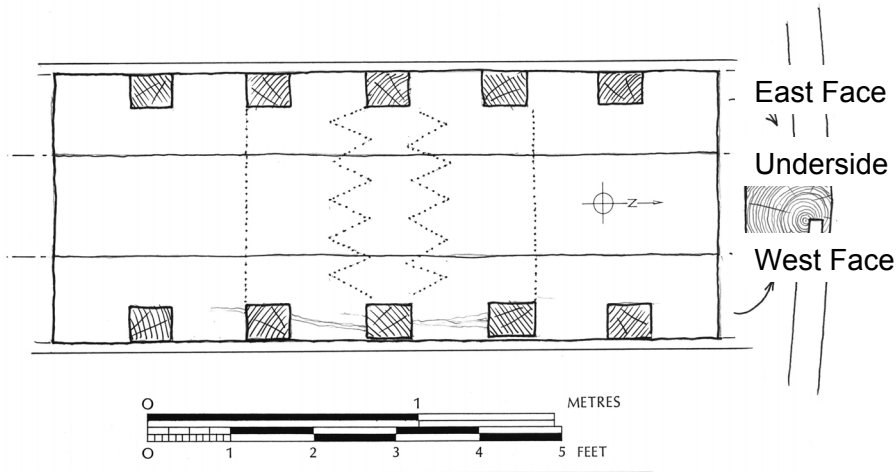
Southern ridge beam of western room showing decorative pattern of tacks
